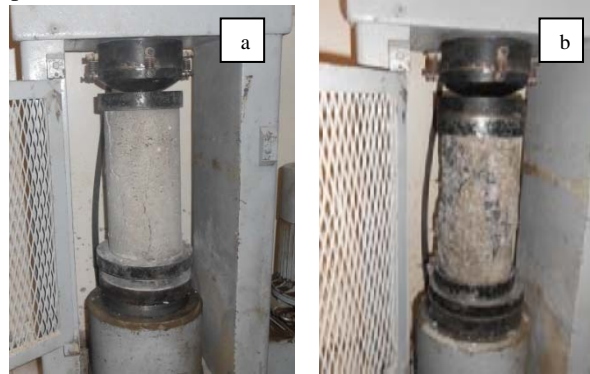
Compressive test a) failure of conventional concrete b) failure of 50% RAP concrete.
